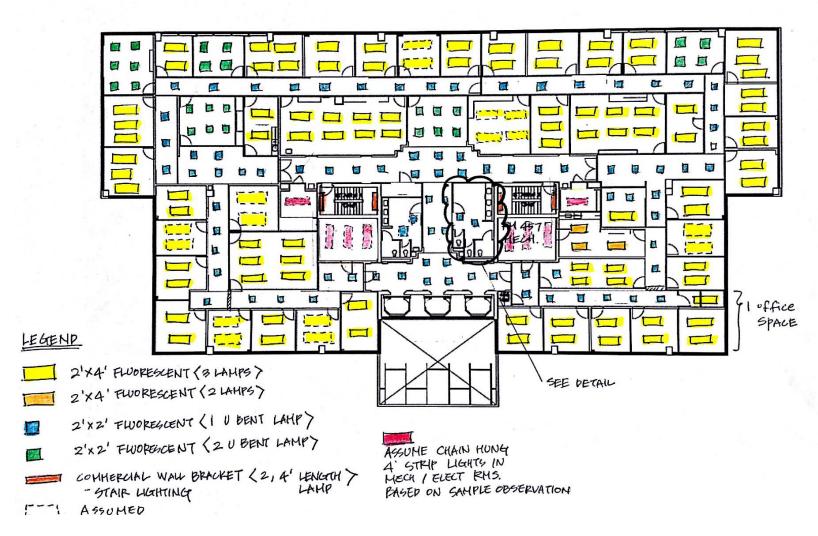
Fourth Floor Lighting Plan for the JBC Building
